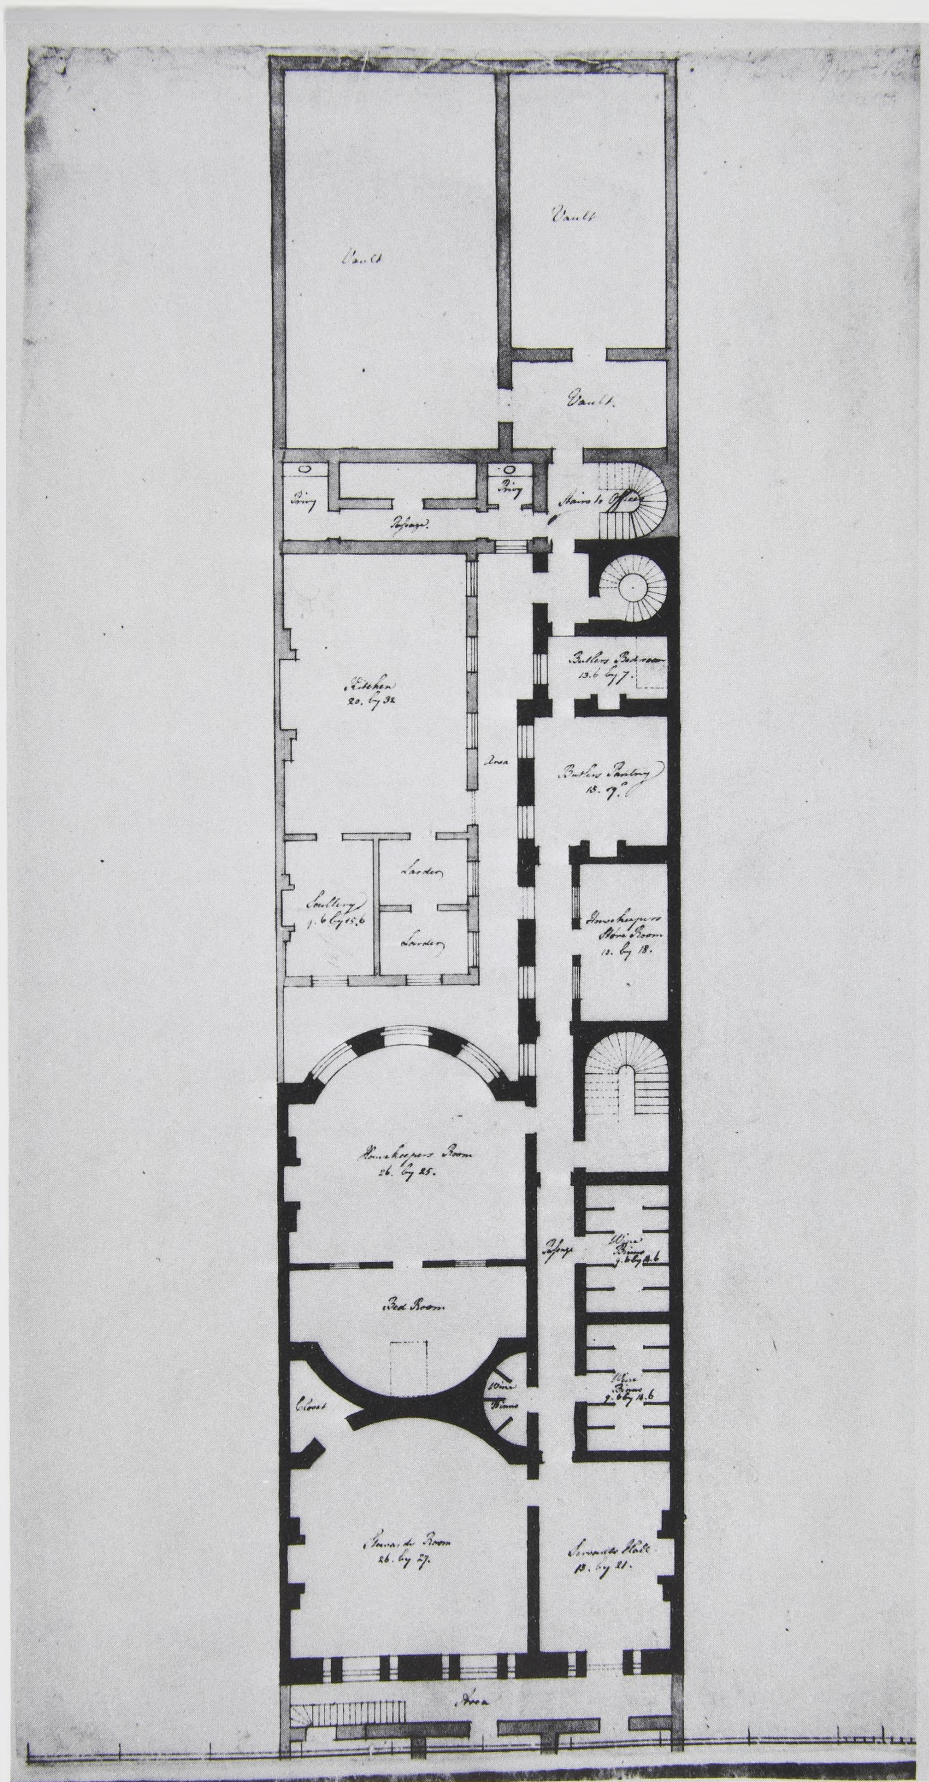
Robert Adam. London, No. 20 St James's Square: Basement plan, 1772
